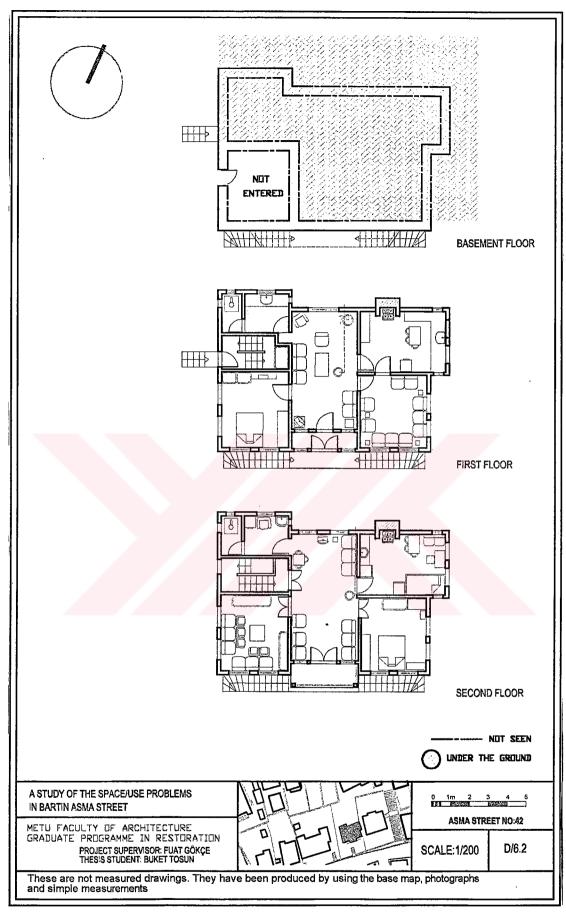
Sketch Drawings of Plans of The Building Noi42
